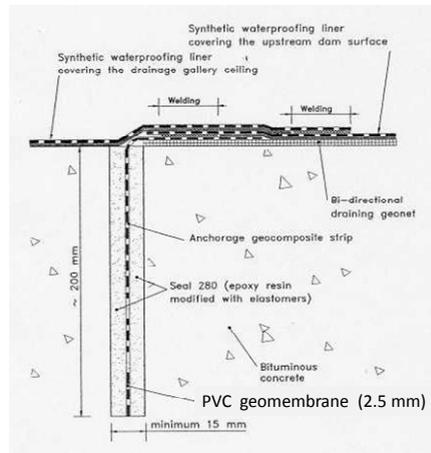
Moravka Dam: the insert type bottom seal on bituminous concrete
